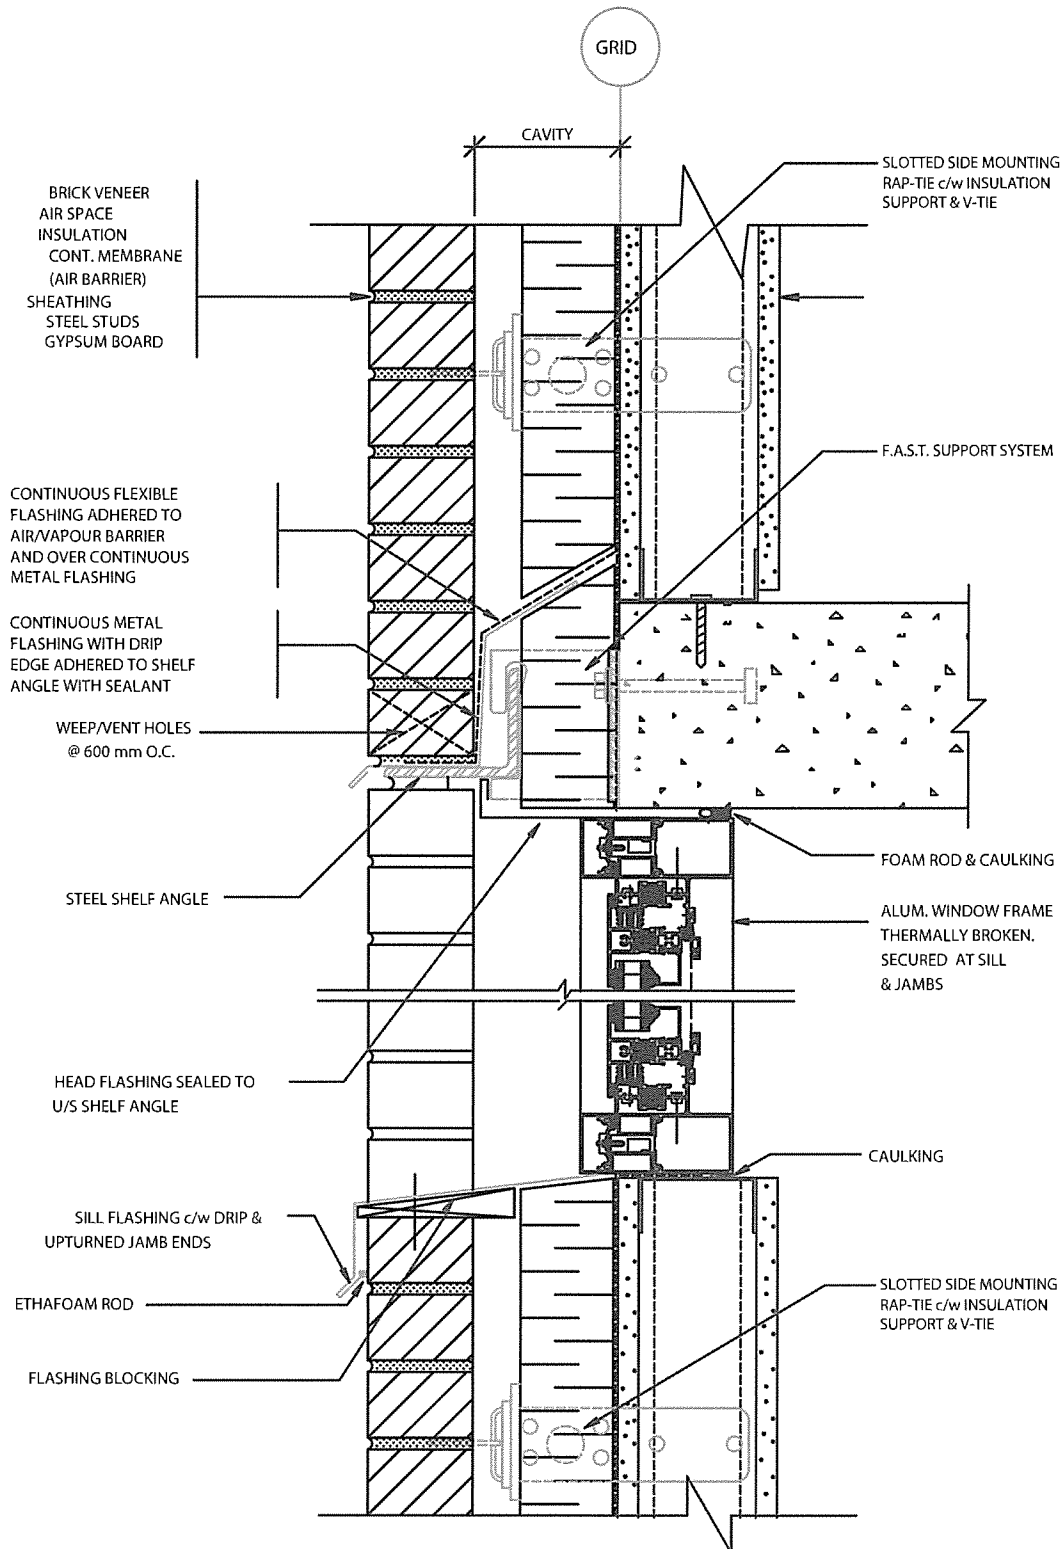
BRICK ALTERNATE BRICK VENEER / STEEL
